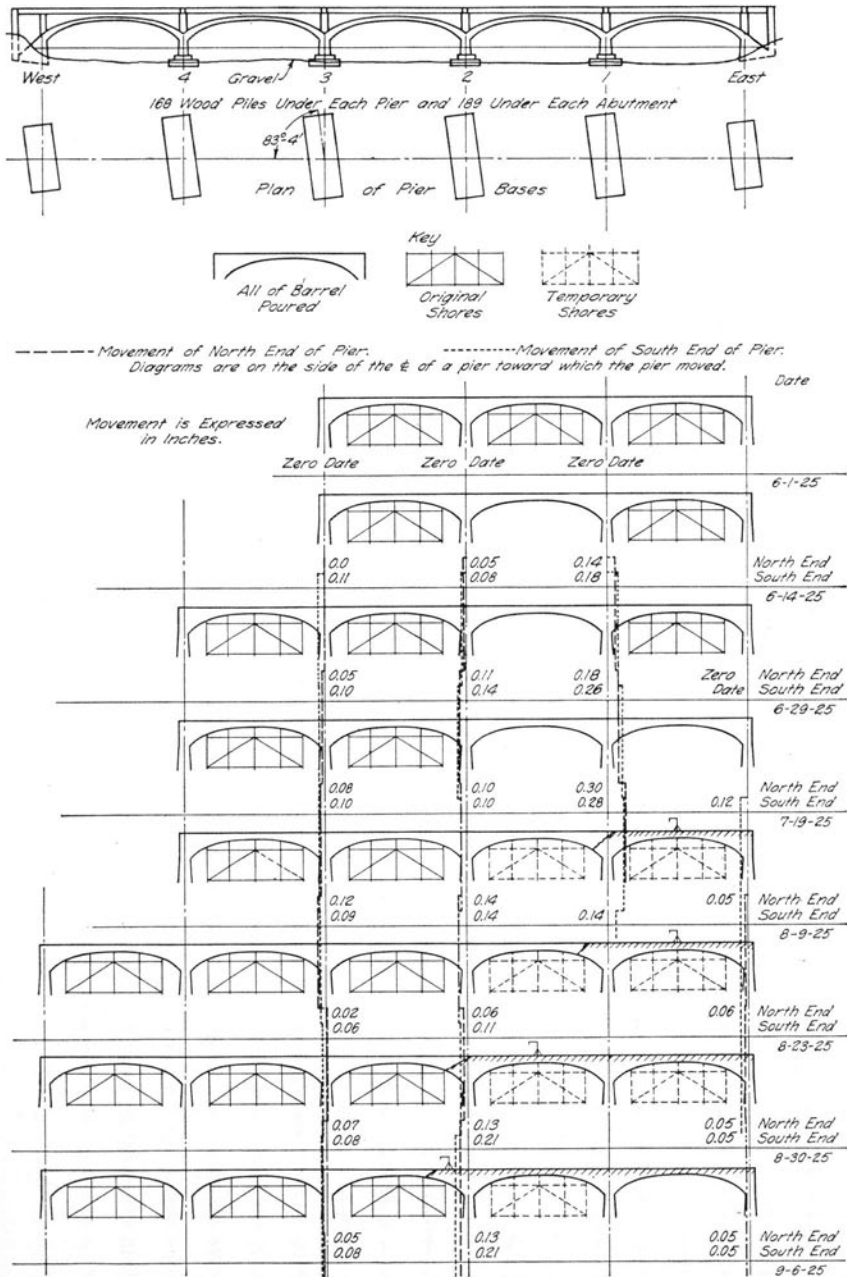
HORIZONTAL MOVEMENT OF PIERS DURING CONSTRUCTION, OLIVER AVENUE BRIDGE, INDIANAPOLIS, INDIANA
